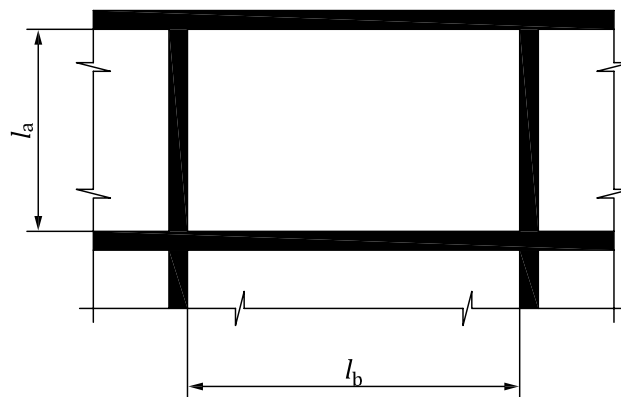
Edge panel with l_b parallel to edge, of two-way slabs supported on girders, beams or walls
